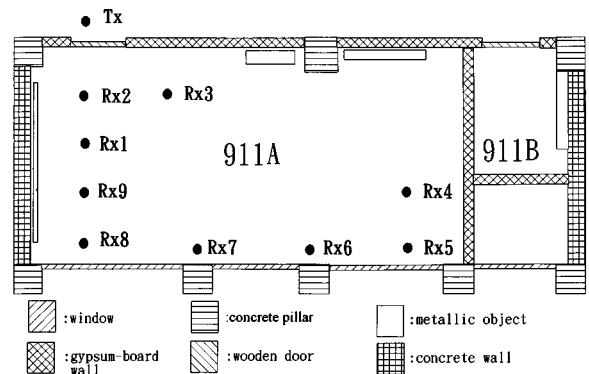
Layout of measurement site No. 1. There are nine receiving positions. Several patches are used to form the walls of room 911A (9 × 10 × 3 m)
